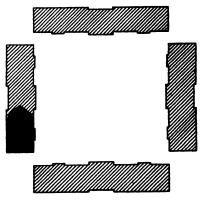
Block plan of buildings in a quadrangle with provision for perflation.
